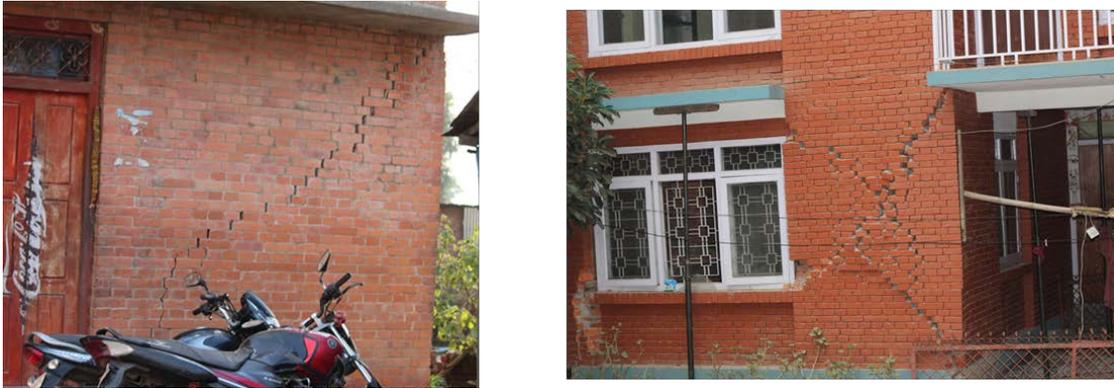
Diagonal in-plane shear cracks in brick masonry walls
